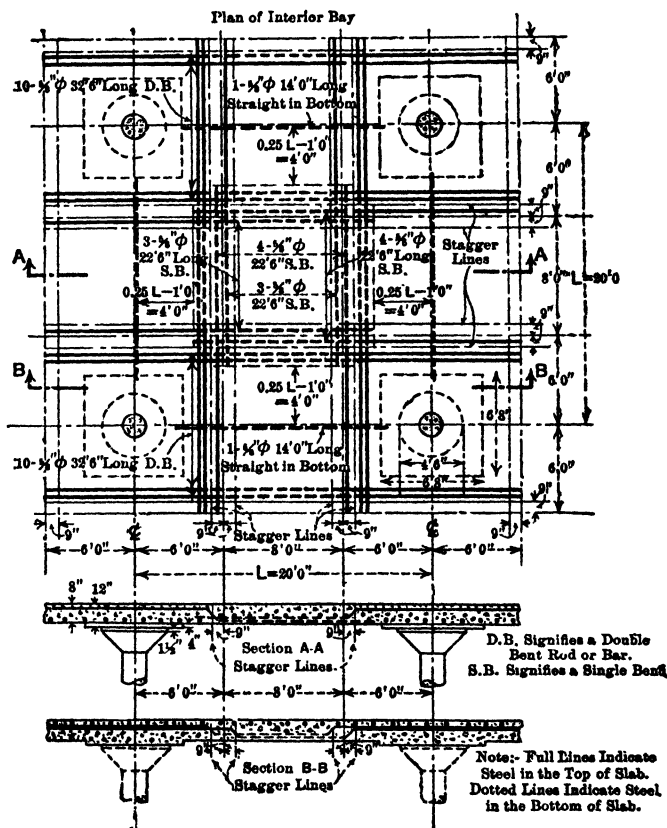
Flat Slab Construction. Details of Reinforcement for a Typical Interior Panel
